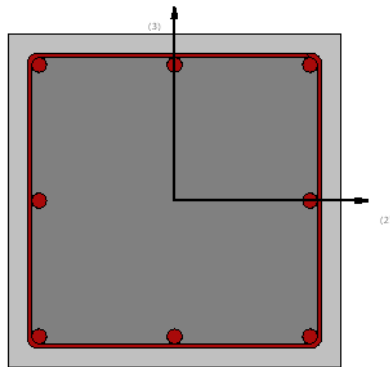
Rectangular column section 0.45x0.45 (8 No.20) for floor (10, 11, and 12).
